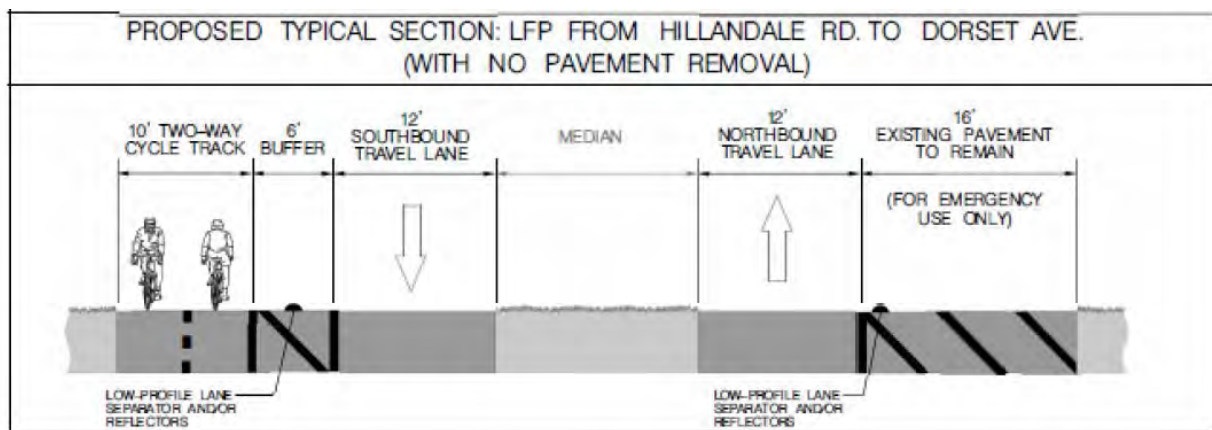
Proposed Typical Section between Hillandale Road and Dorset Avenue as approved by County Council
